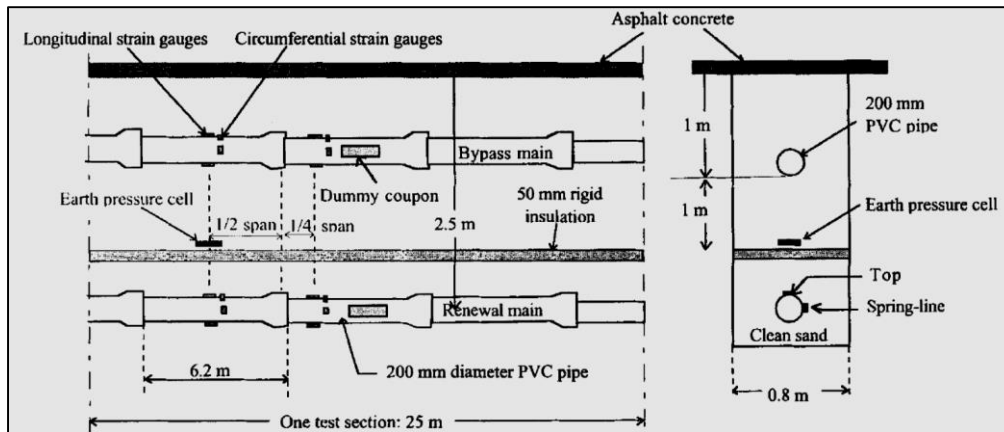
Typical Section of Renewal and Bypass Mains in Edmonton, Canada (Zhan and Rajani, 1997)
